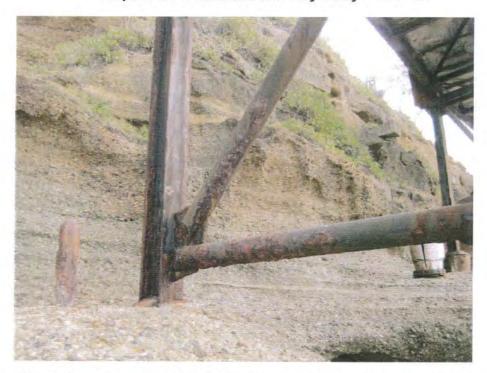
A detailed view of corrosion damage to the base of a Bent. Note the damage to the connection plate.
